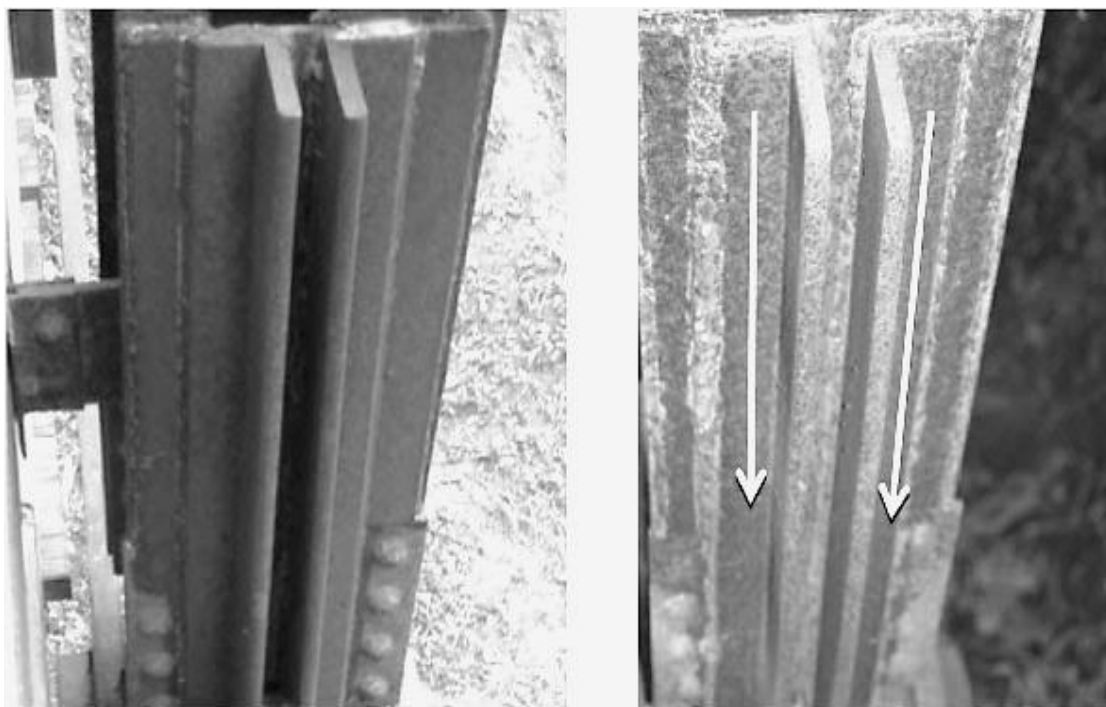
Retrofitted Steel plates (left) and Rusting of Steel plates (right).
